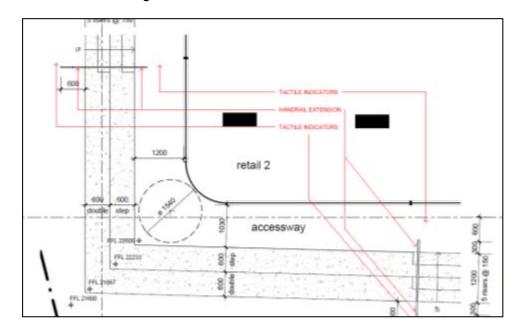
Extract from ground floor plan identifying pinch points and access arrangements
